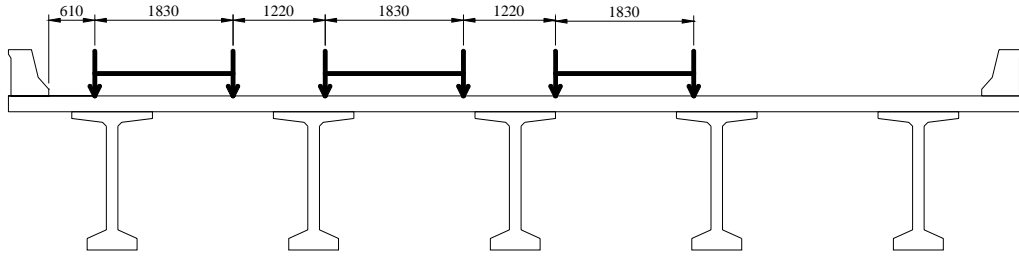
Standard Vehicle Spacing (Precast Bulb-Tee Beam)
